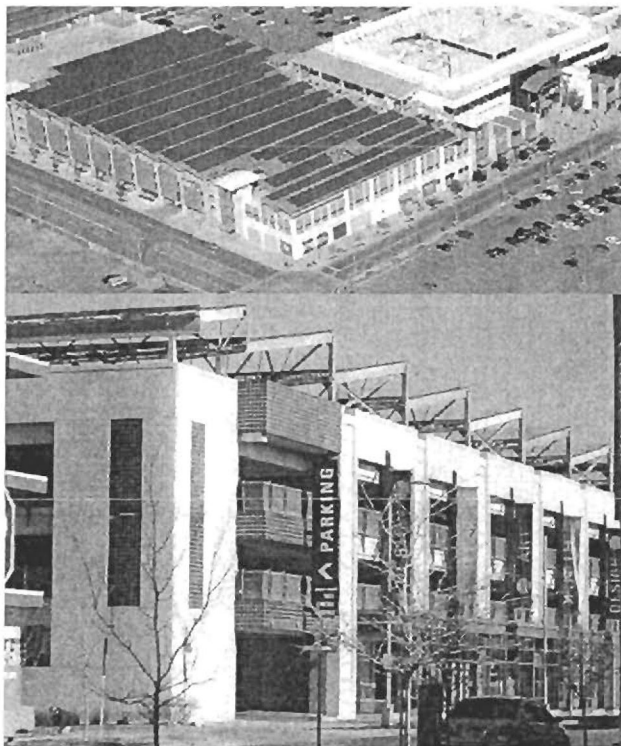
D.3.A: Green roof panels installed on a large commercial building.
